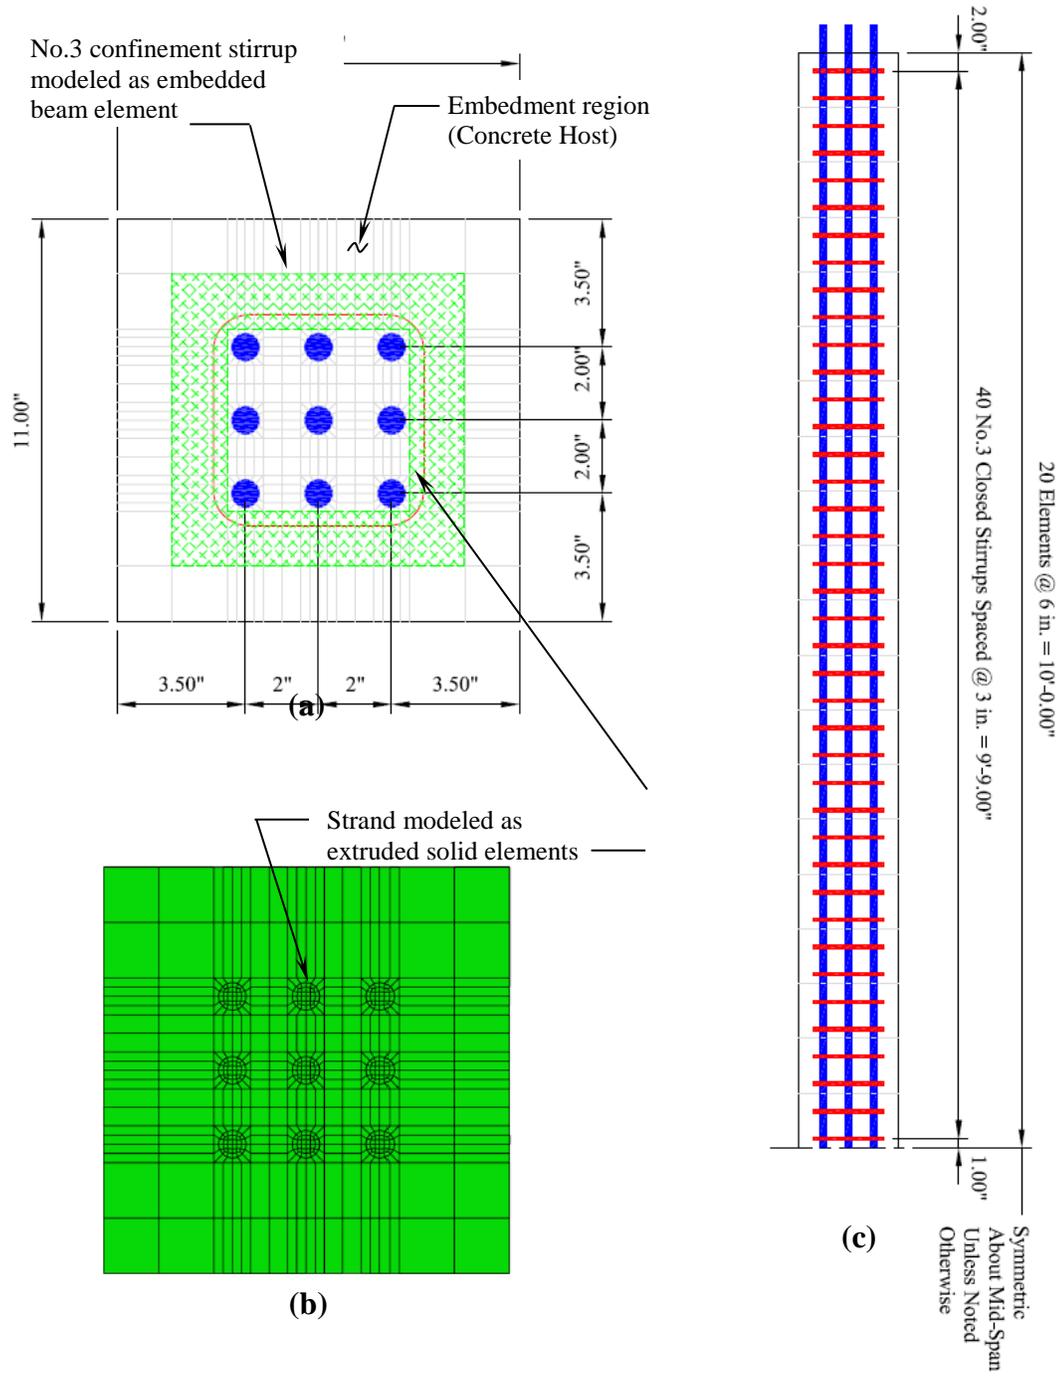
Details of Class I [S200-U070-C3; S200-U140-C3] finite element models: (a) Typical cross section, (b) Finite element simulation, and (c) Layout of confinement reinforcement (No.3 closed stirrups spaced at 3 in. on center)
